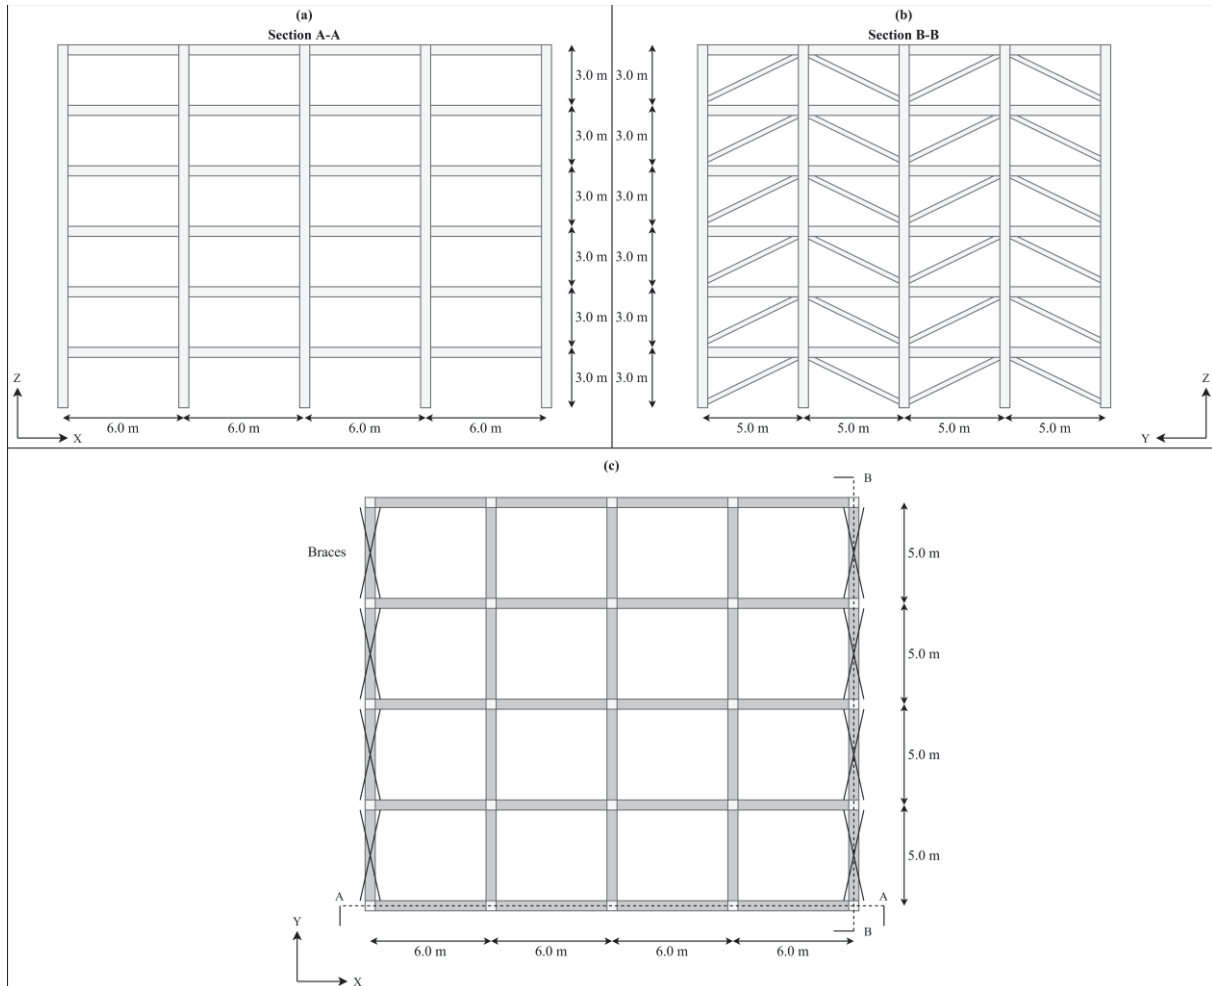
Structural layout: a) moment-resisting frame, b) concentric braced frame, c) plan-view of the building.
